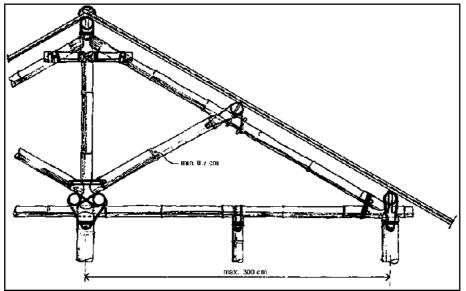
Bamboo roof trusses. Courtesy UNDP/UNIDO, RENAS-BMTCS, Manila
